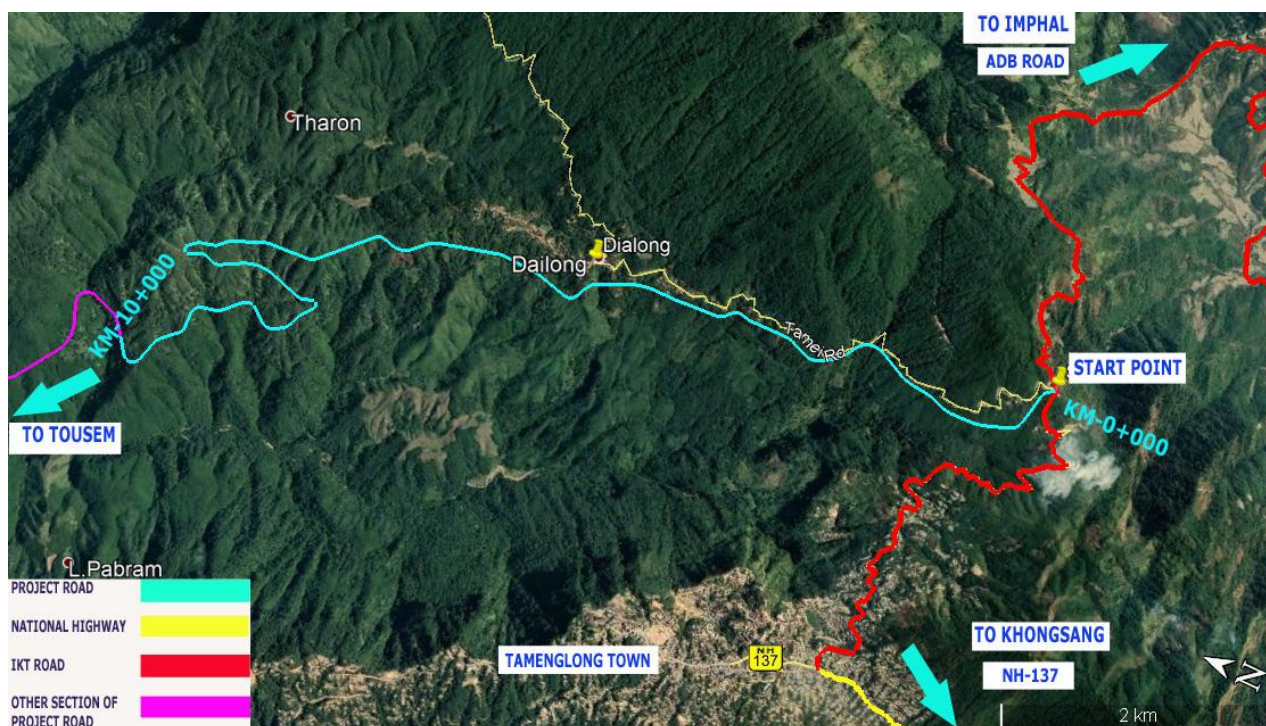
Location Plan of Pkg-1 (Tamenglong-Dialong Section)
